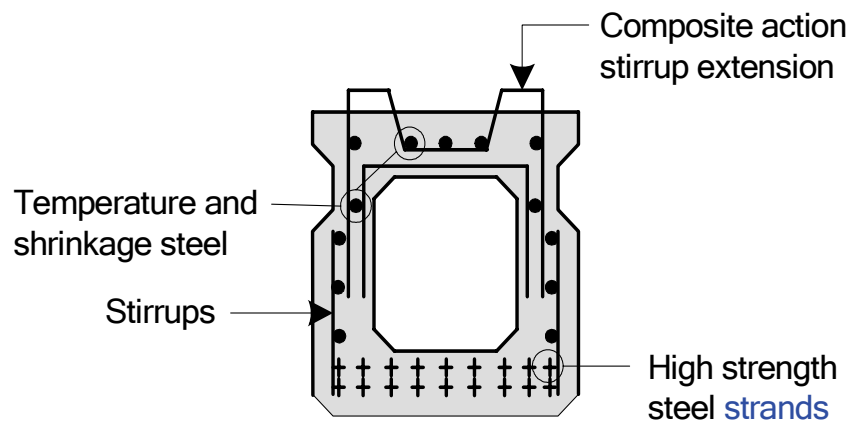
Typical Prestressed Box Beam Reinforcement
